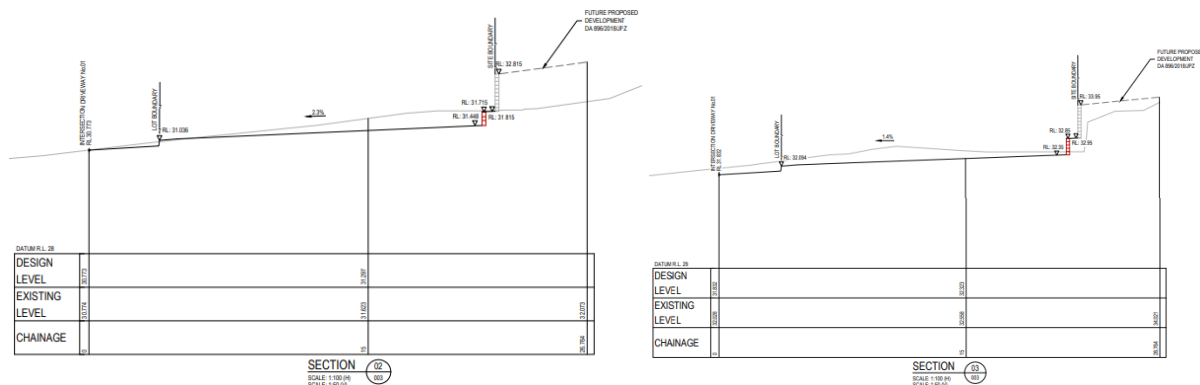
Sections 02 and 04 corresponding to Earthworks Plan (Figure 1)
